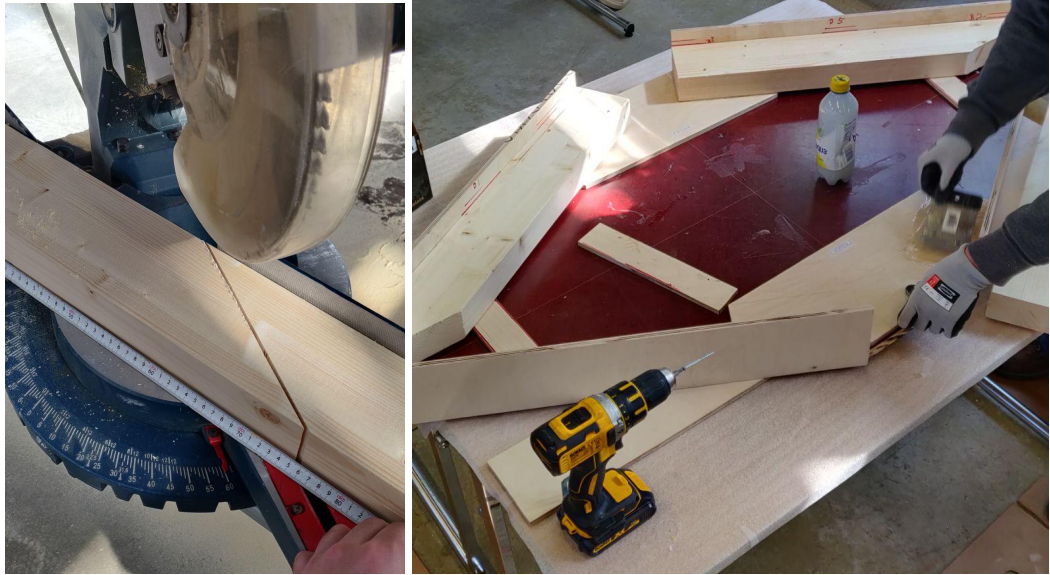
Miter of glulam and template for mounting of specimen parts
